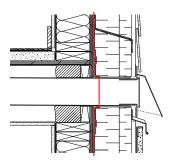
Wall penetration exterior air barrier redline detail (annotations not shown).
